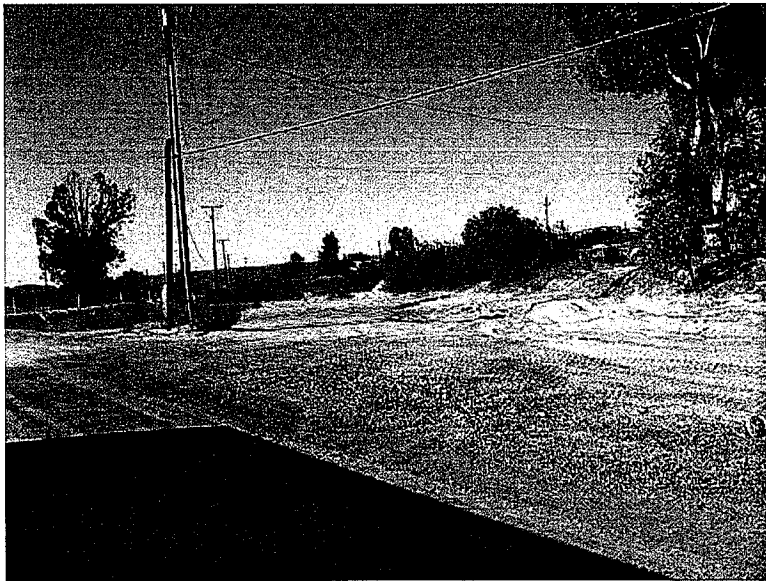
Downstream of the confluence of Santa Gertrudis Creek and Long Valley Wash from Nicolas Road.
